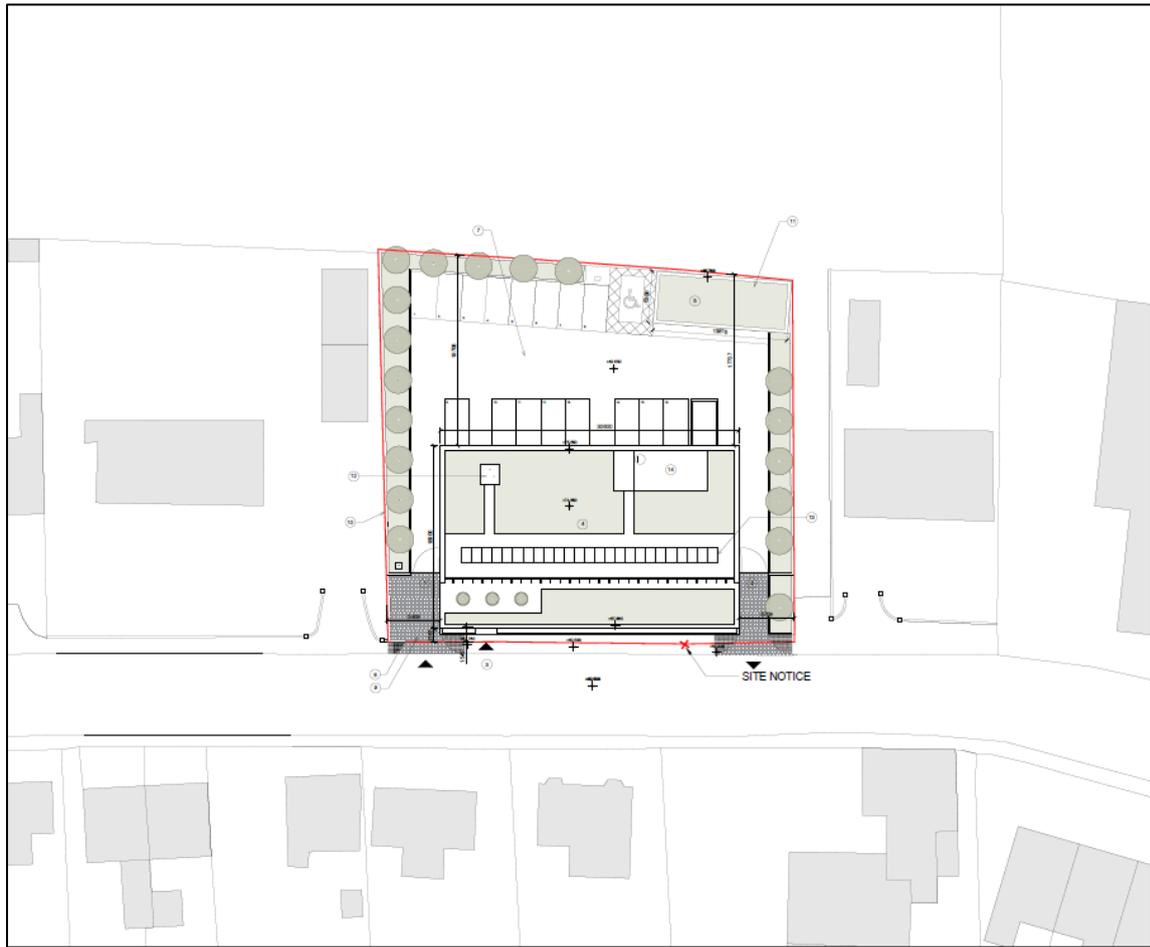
Extract from Site Layout Plan (as prepared by Cotter & Naessens Architects)
